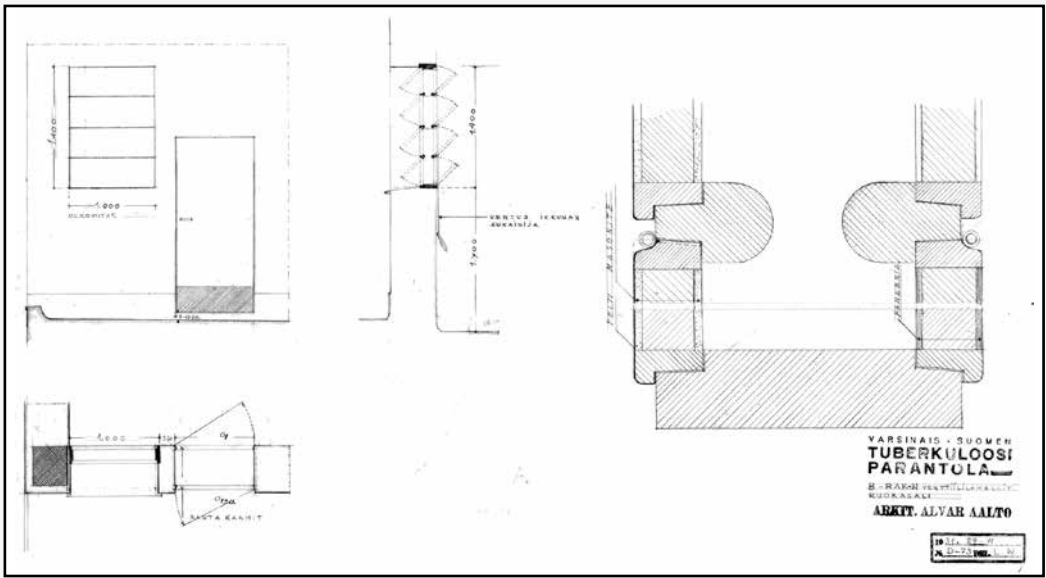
The dining hall shutter vent in B wing. The vent had a similar opening mechanism to the health window. Drawing No. 50-352. The drawing has been edited. AAM.
